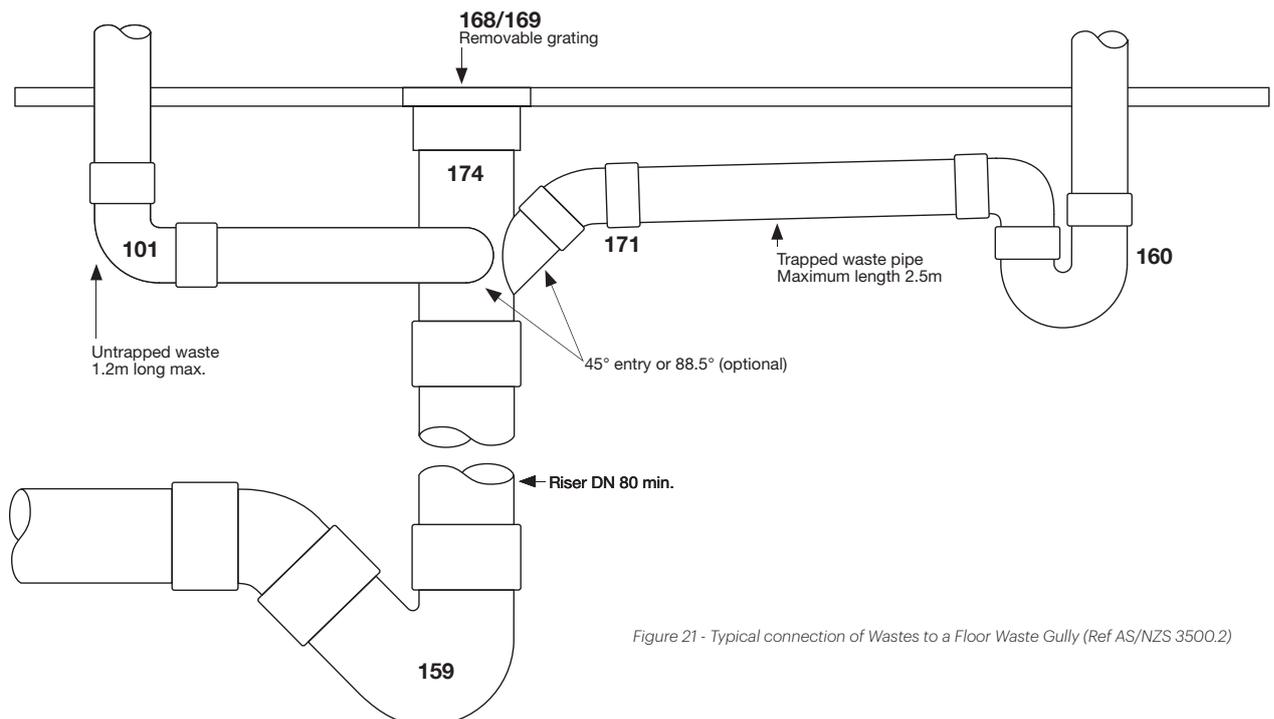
Typical connection of Wastes to a Floor Waste Gully (Ref AS/NZS 3500.2)
